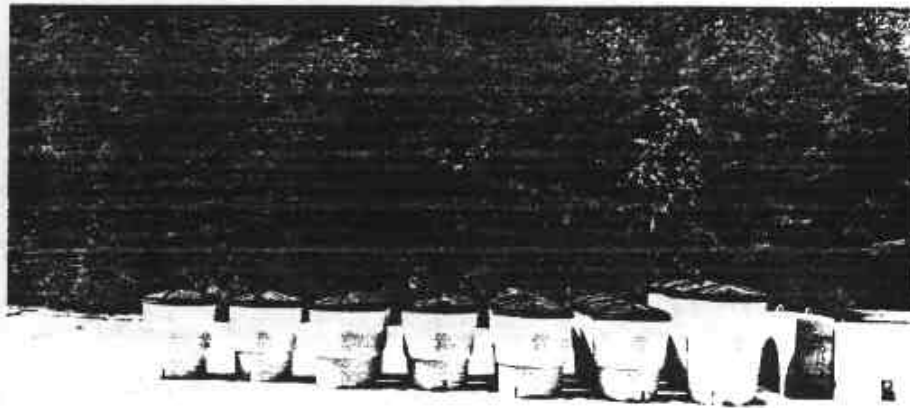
Pre-Test Photograph of Inertial Impact Attenuator,
